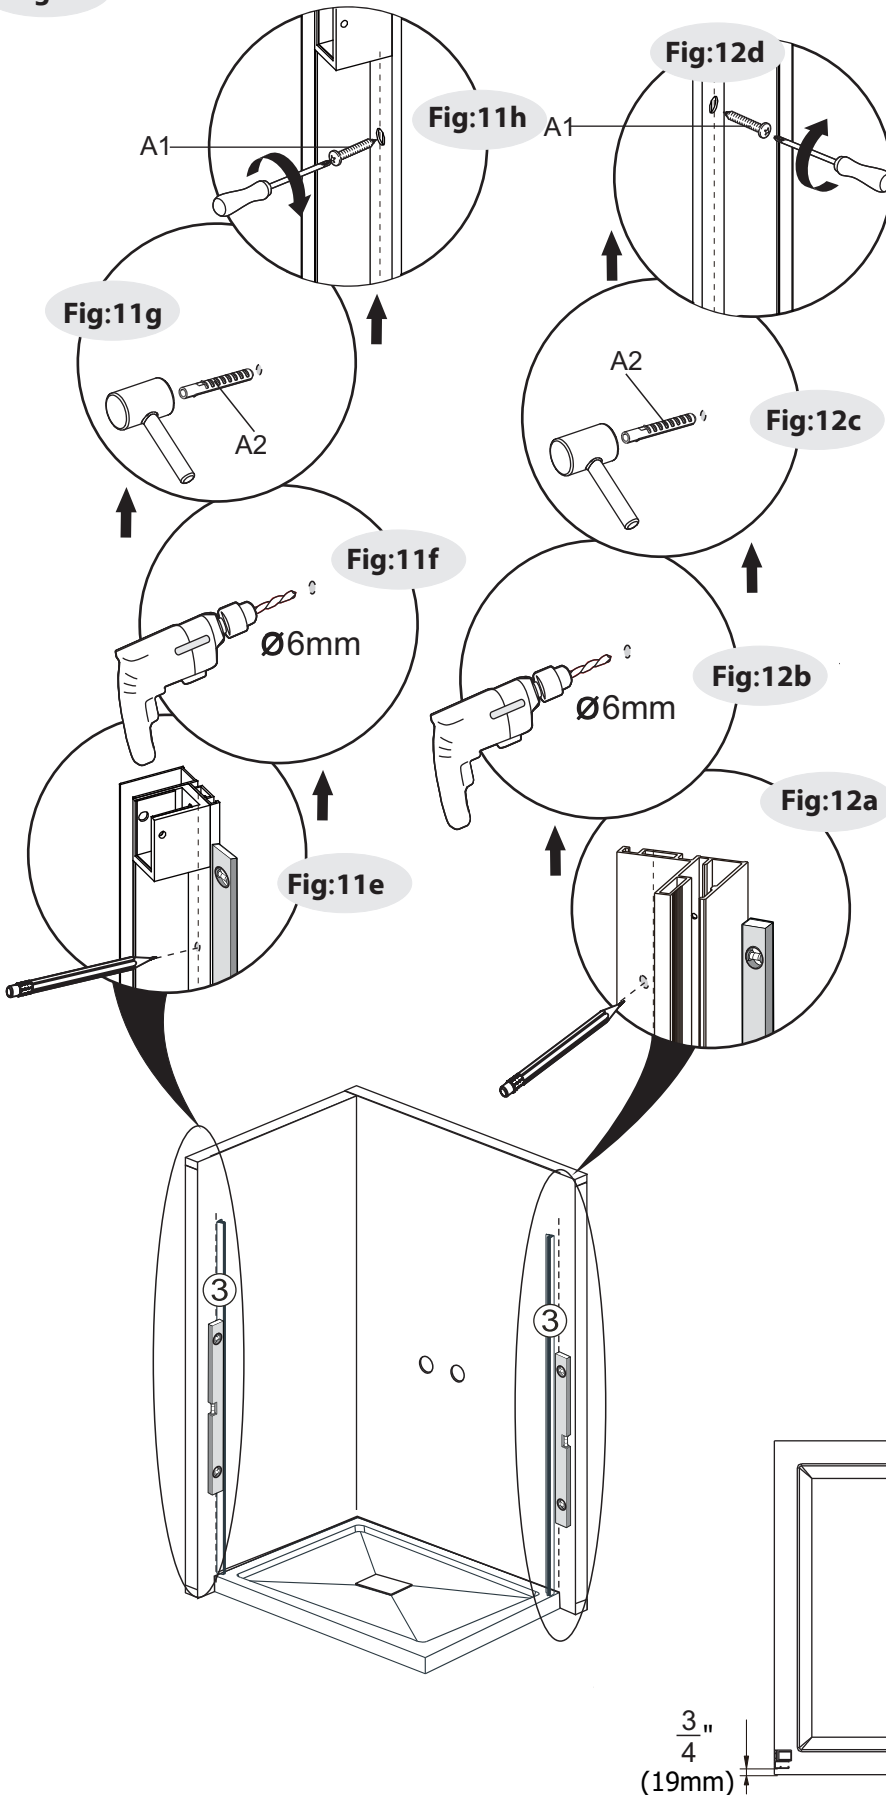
& 12a Position and level both wall profile(#3) 3/4 " from the outside edge of the shower base, and mark the fastening holes.
